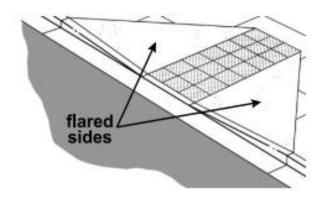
Flare Slope (Source: ADA Accessibility Survey Instructions Manual)
